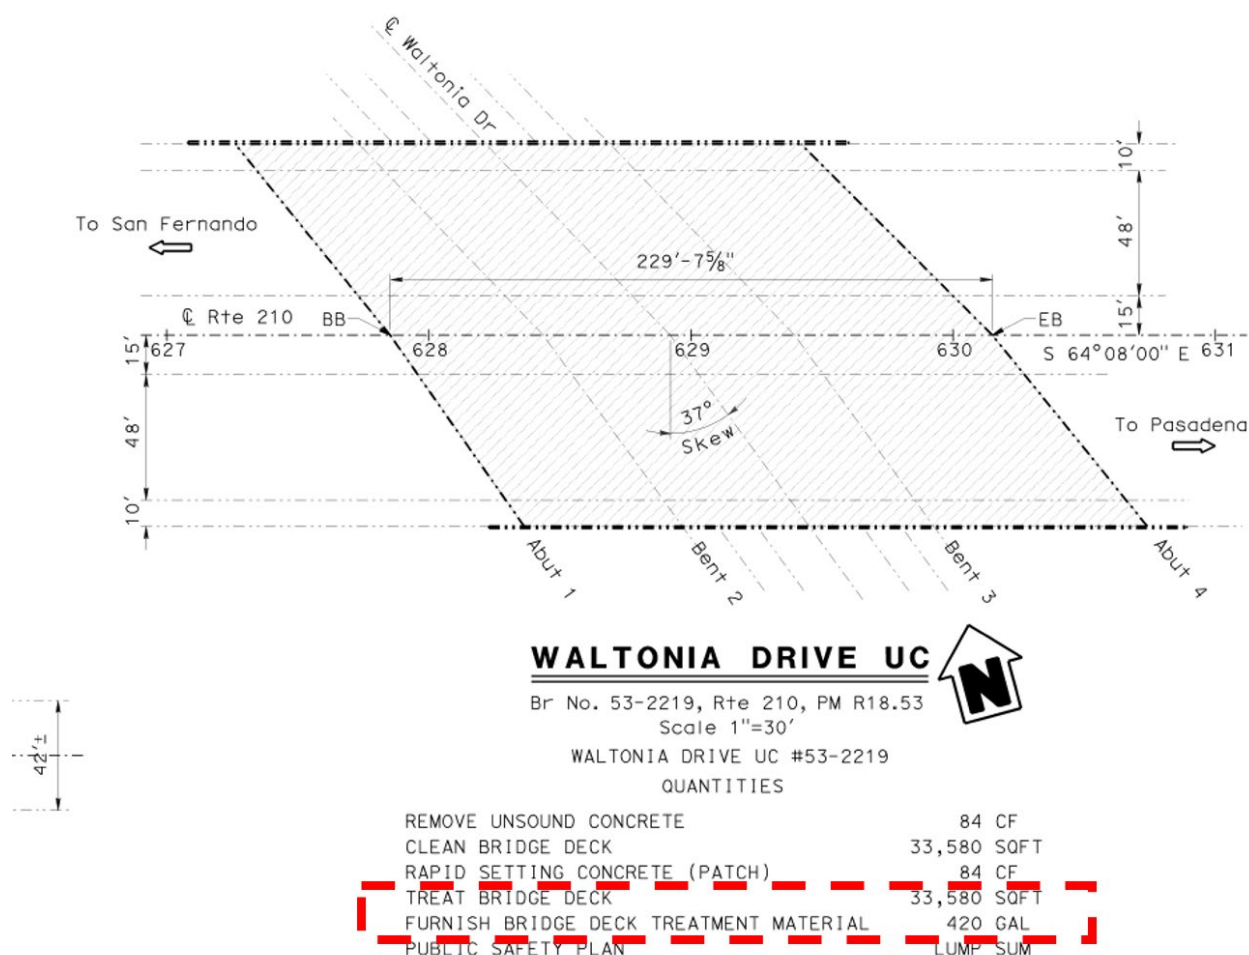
Bridge Plan with Bridge Deck Treatment Work
